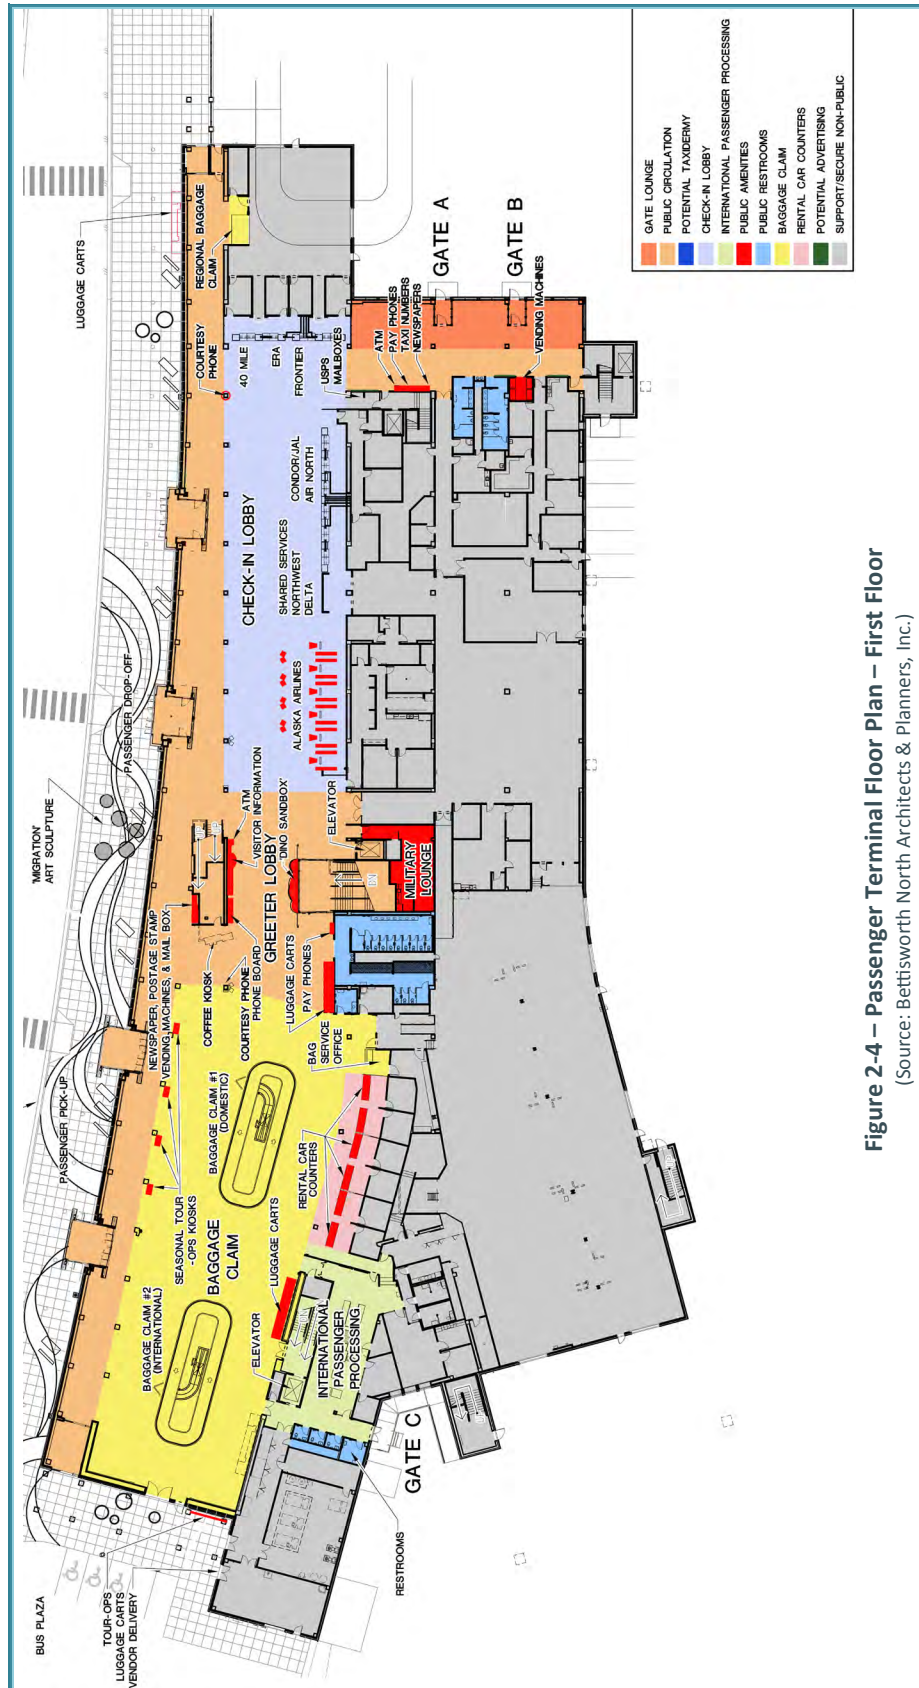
Passenger Terminal Floor Plan – First Floor
